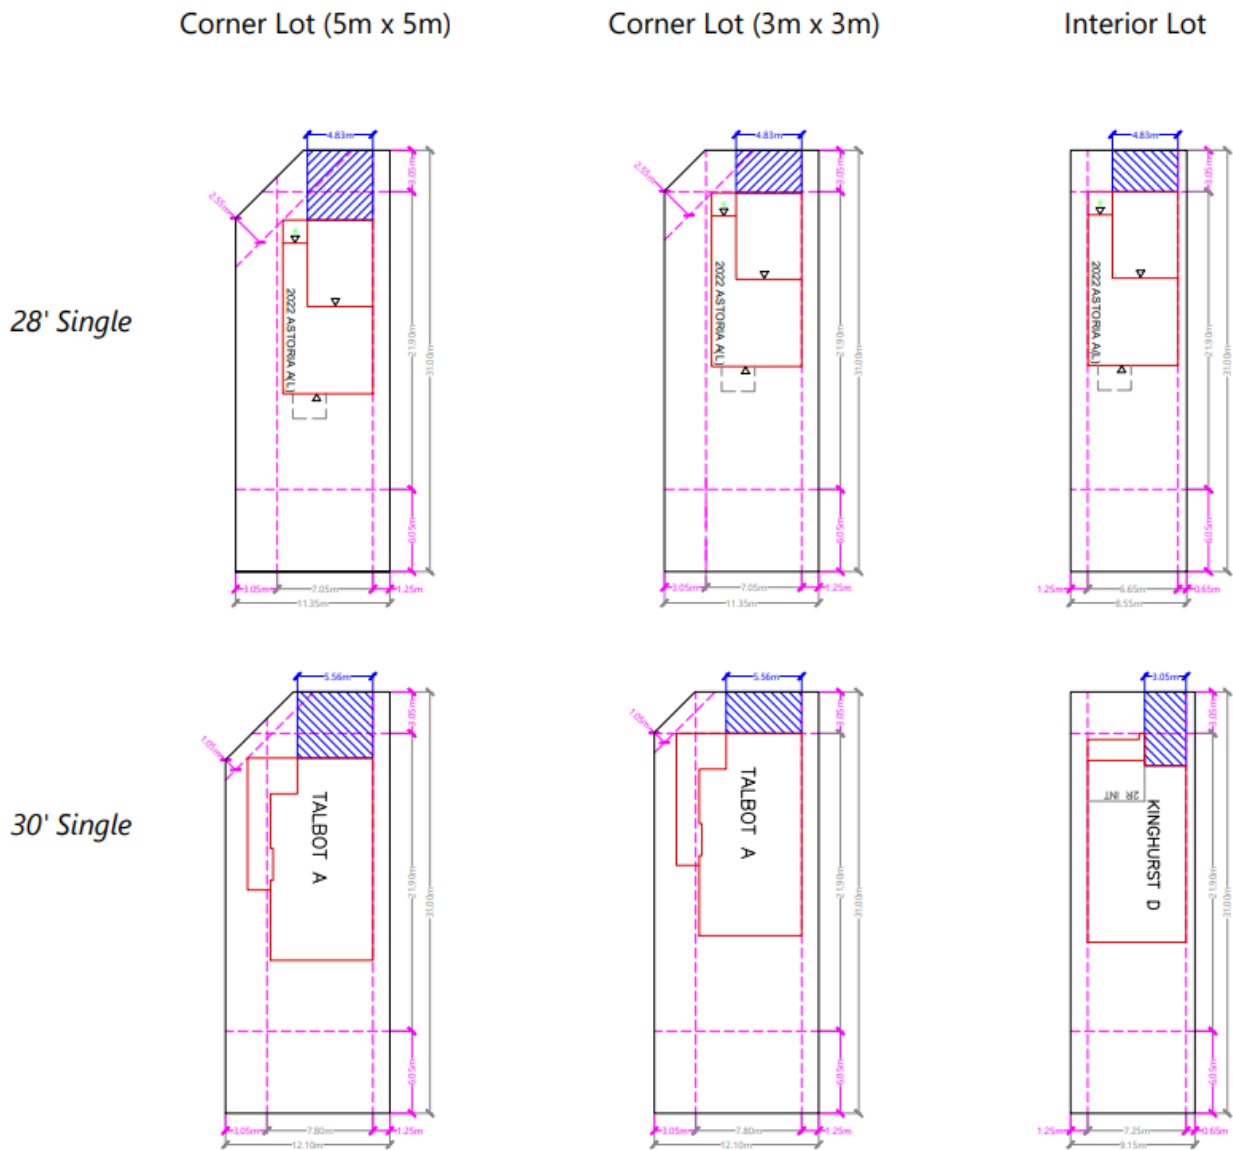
Conceptual Site Plan Layouts for 28' and 30' single-detached dwelling lot widths. House footprints, outlined in red.
